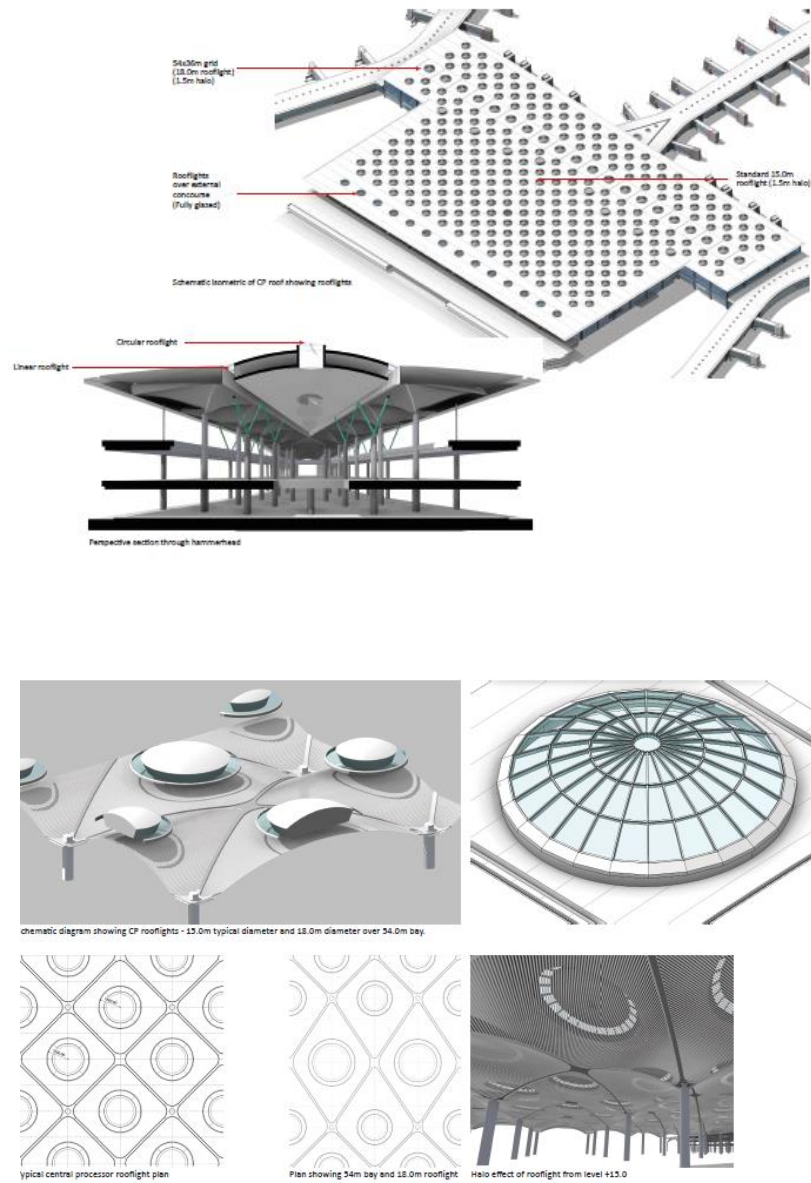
Structural diagrams of roofs and roof lights (Source: The New Airport Design Report, n.d.)
